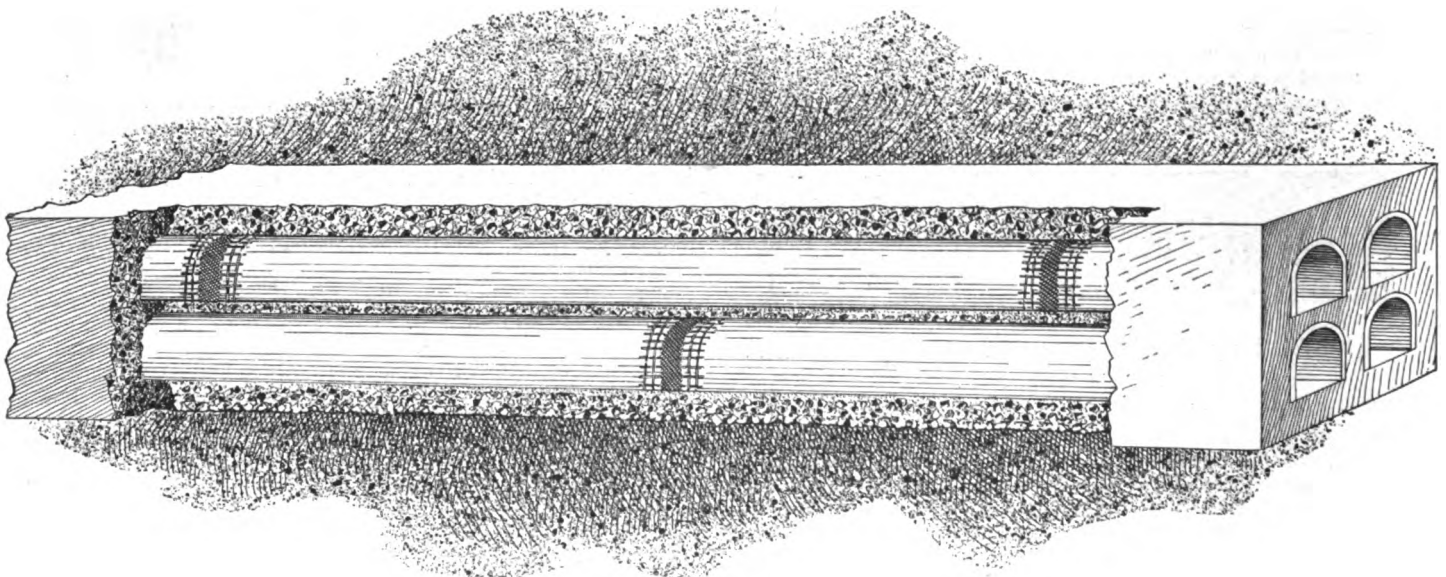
GENERAL VIEW OF SEWALL CONDUIT.
